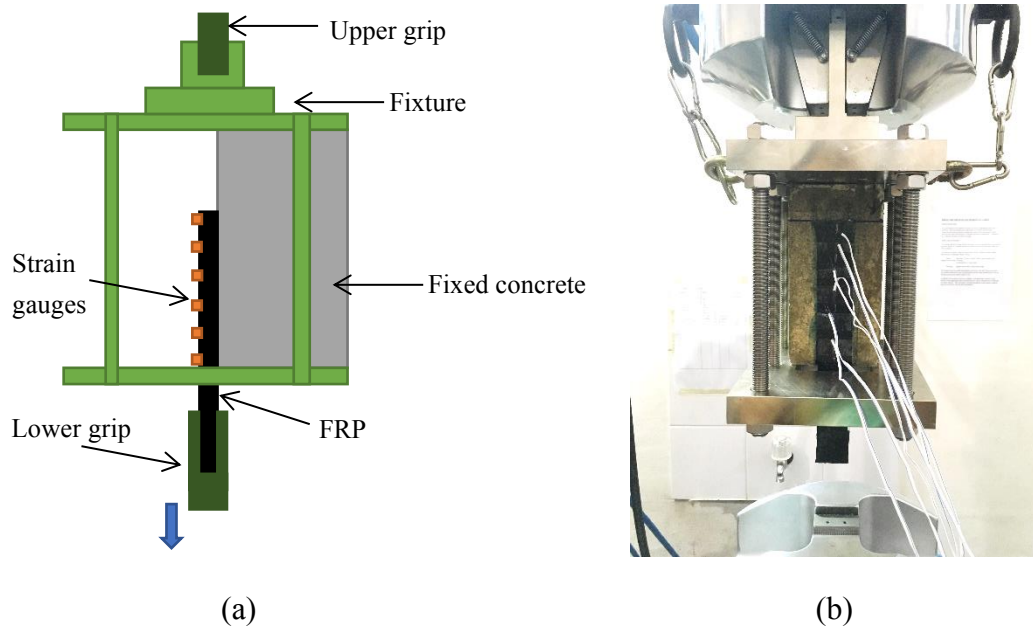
Test set-up using MTS servo-hydraulic test machine: (a) schematic diagram of side view and (b) photograph of front view
